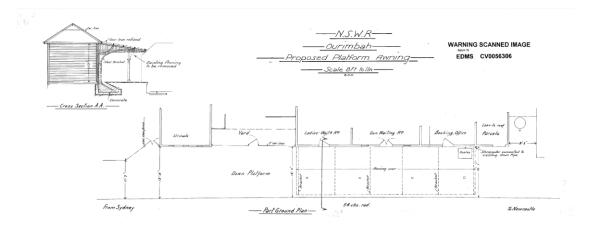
Image of the original plan of the proposed awning to the station building on Platform 2, c1911. Source: Sydney Trains Plan Room
